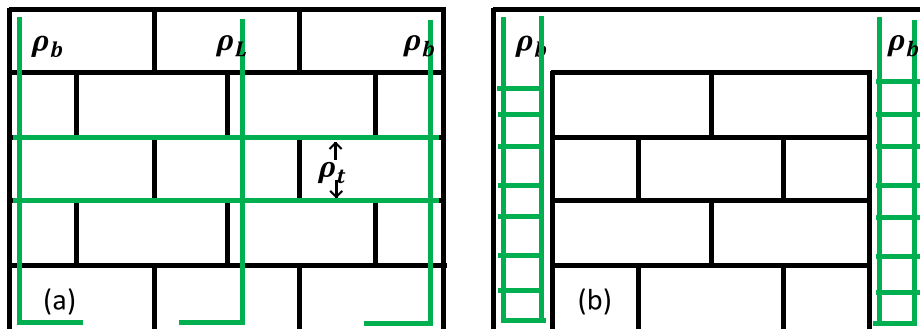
(a) reinforce masonry wall, and (b) confined masonry wall.
